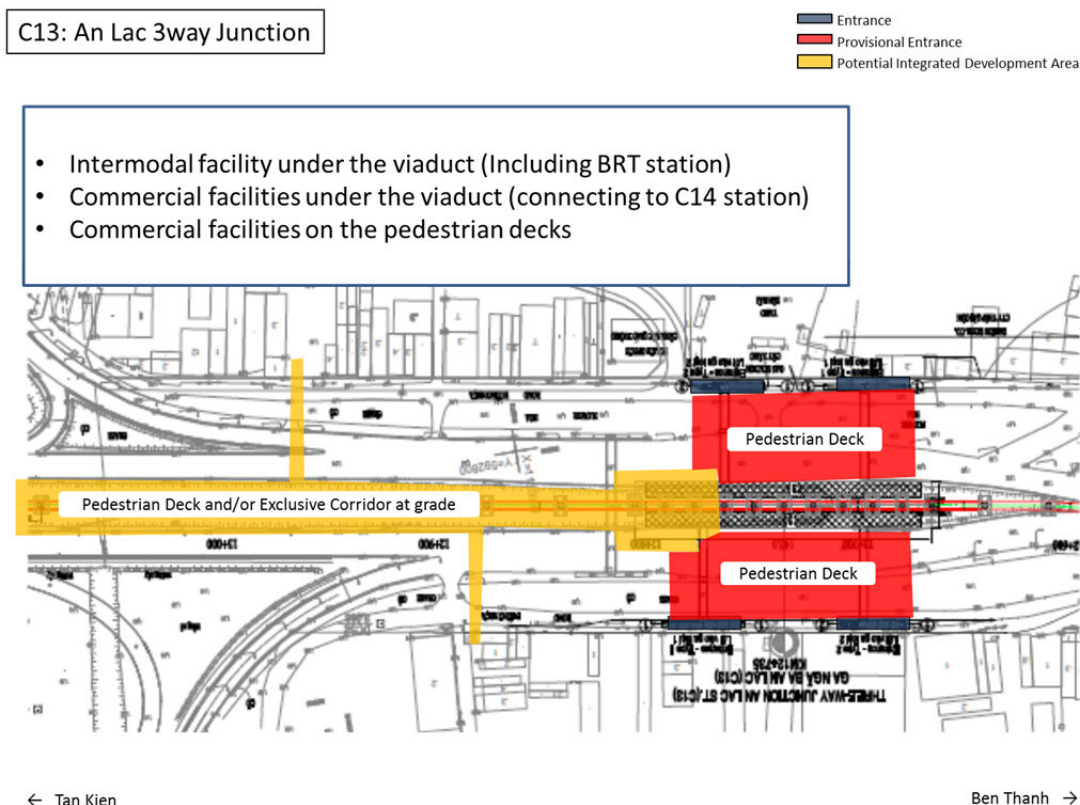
Development Concept of An Lac 3way Junction Station
